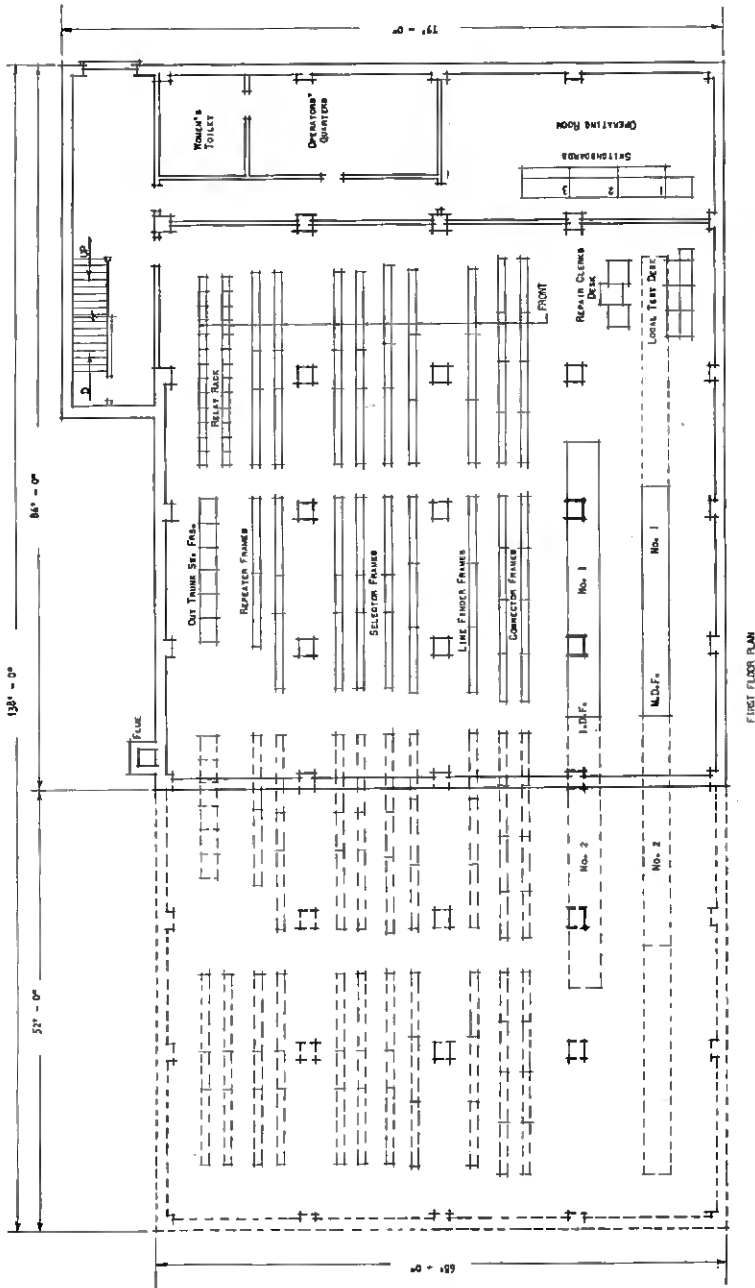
Standard floor plan for step-by-step dial office designed for best arrangement including flexibility for future growth.
